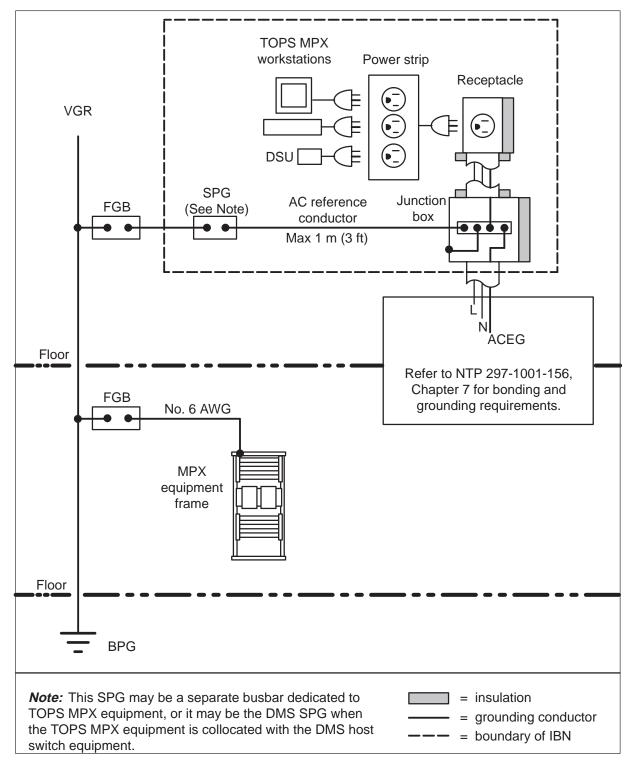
TOPS MPX grounding: typical single-floor IBN installation
